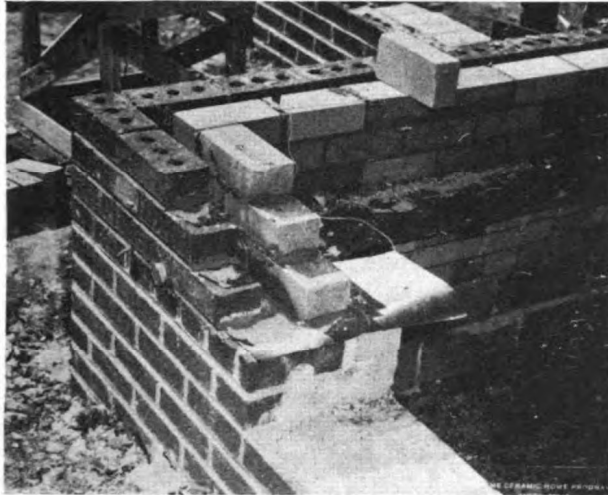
Building No. 3. Detail of cavity wall showing wythes of brick and tile.
